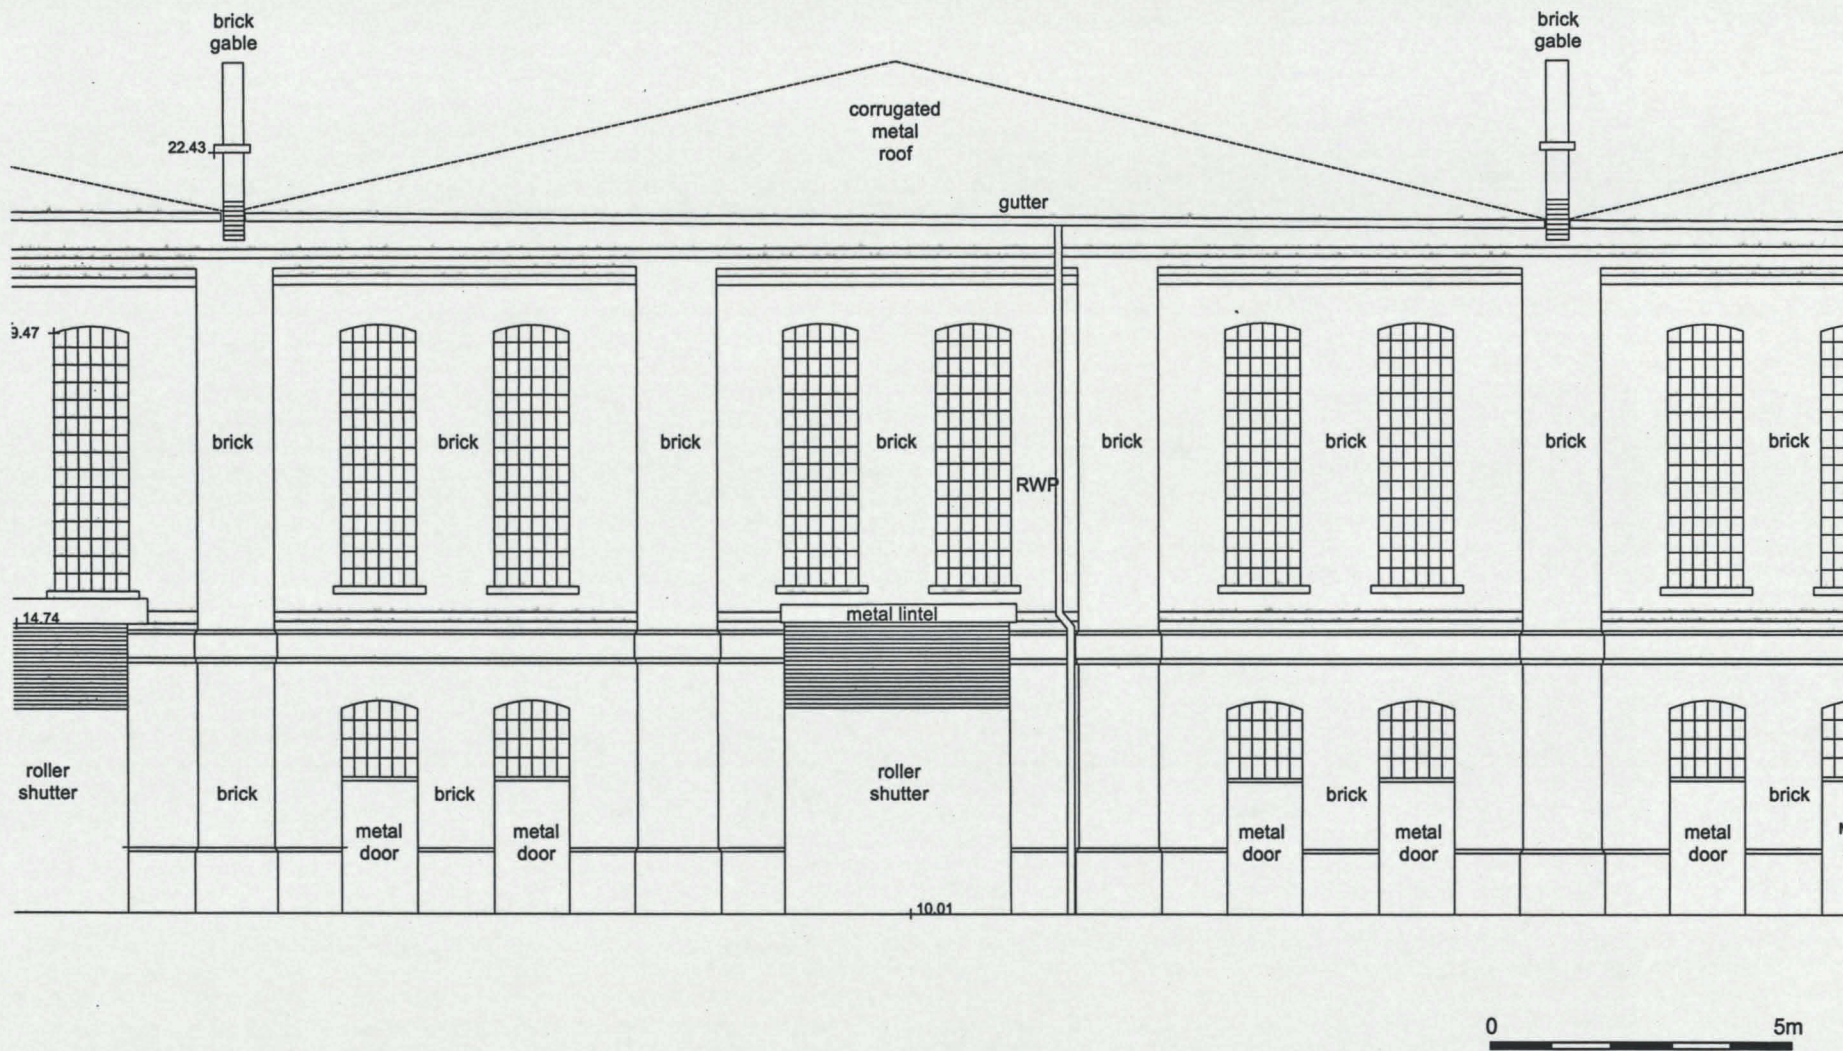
Sectional elevation showing southern face of warehouse 'P'
